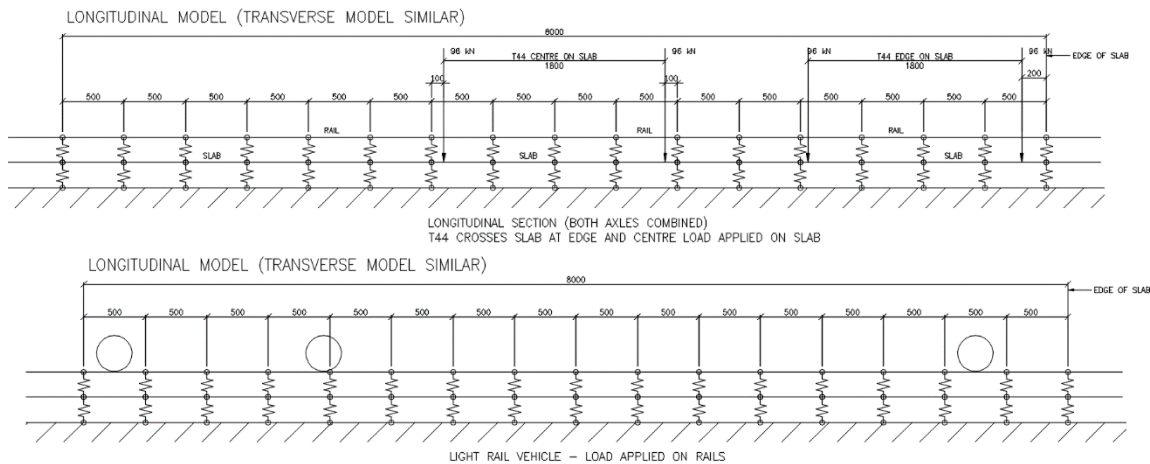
Longitudinal section. T44 load application on slab and LRV load on rails
